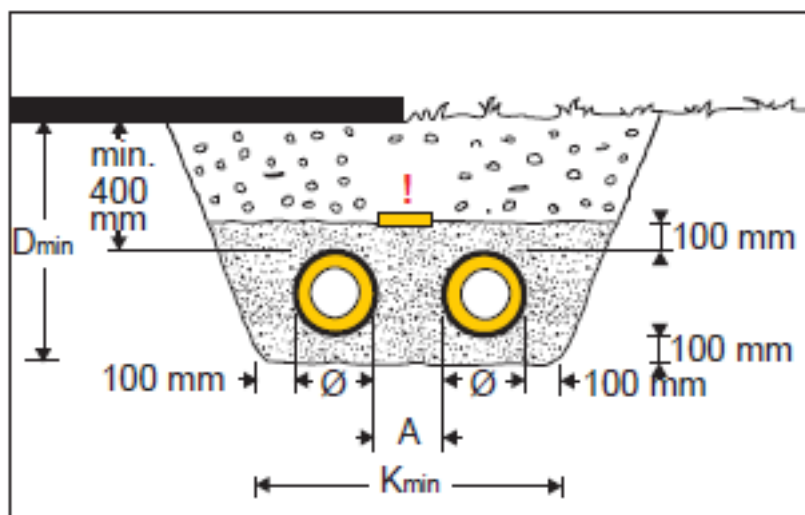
Manufacturer's indicative minimum trench dimensions (source: Logstor Handling & Installation, Version 2015.06)
